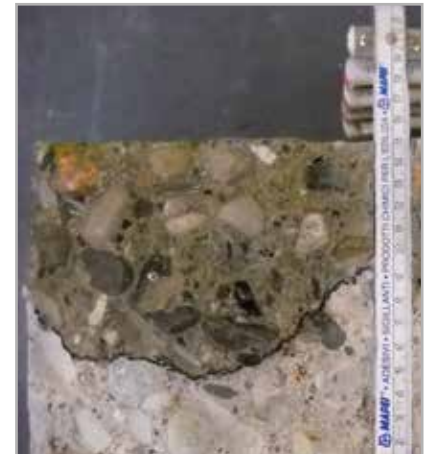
Concrete with a water/cement ratio of 0.6
